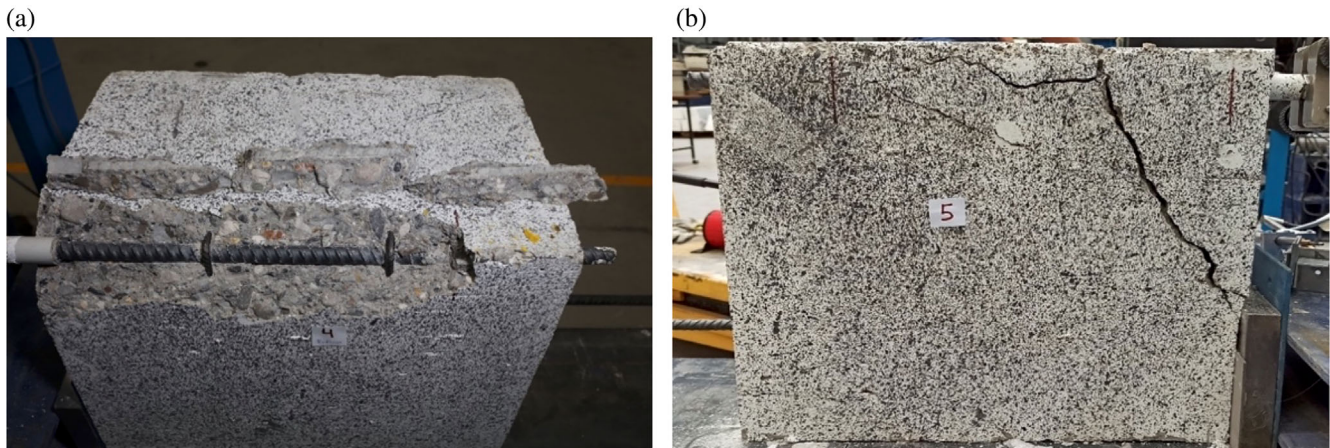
Splitting failure (a) and mixed failure mode with concrete cone blowing off (b).
